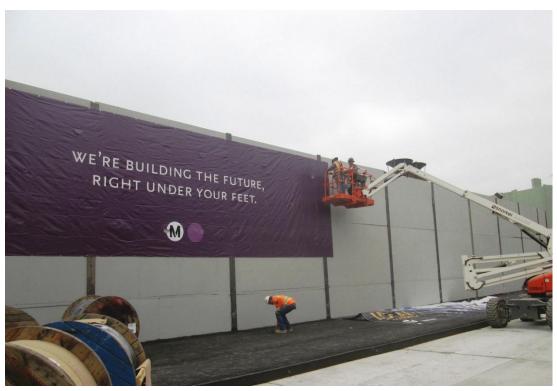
Typical 20-foot Noise Barrier at Construction Staging Areas
